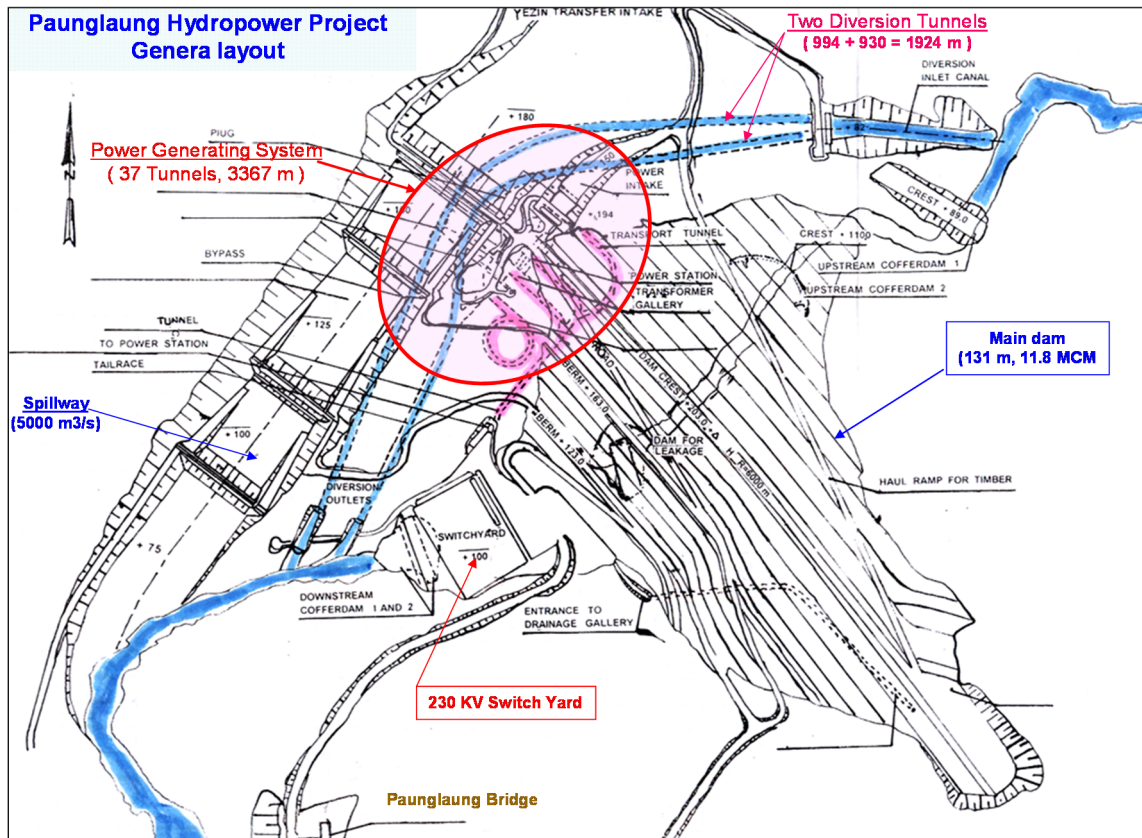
General Layout of Paunglaung Hydropower Project (Source: Wan Kyi, 2009)
